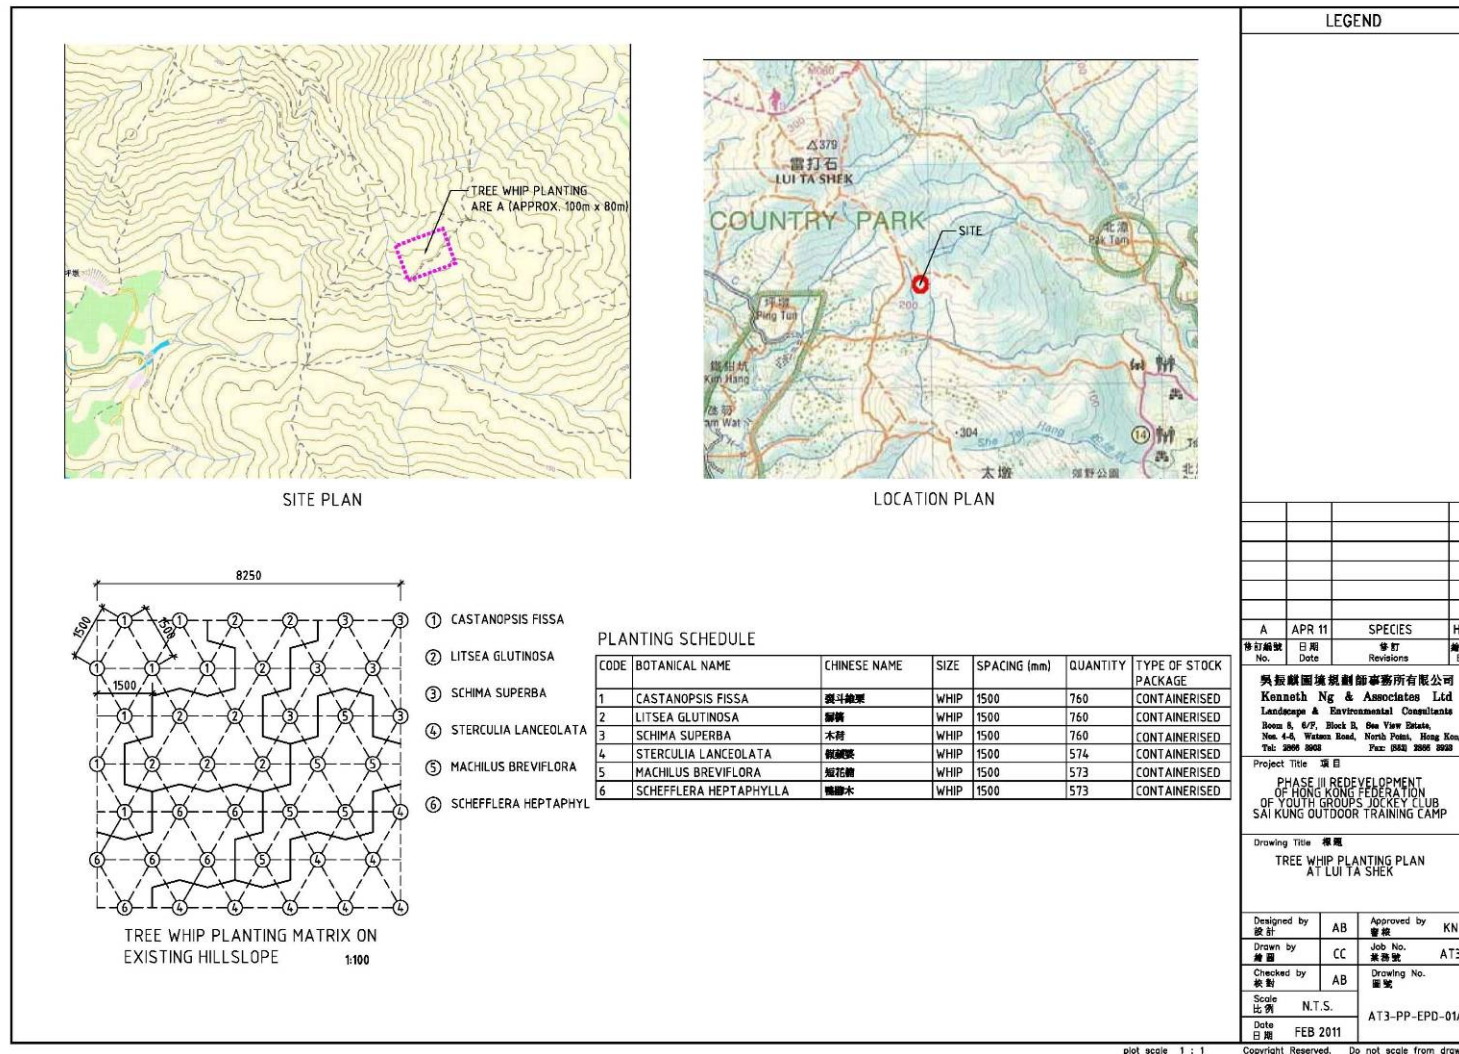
Tree Whip Planting Plan for Off-Site Woodland Compensatory Planting at Lui Ta Shek
